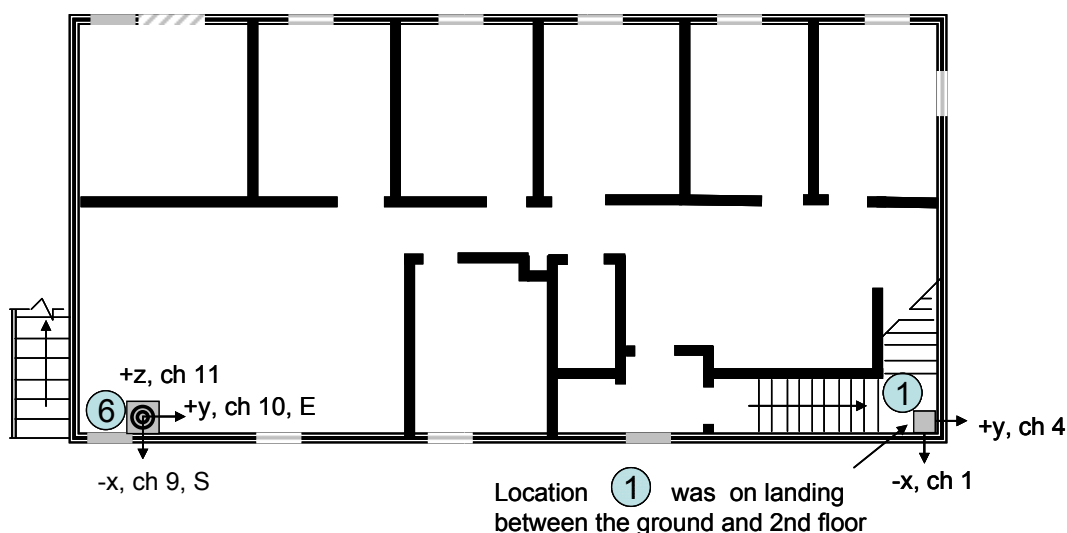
Plan Schematic Showing Numbered Locations and Orientations of Accelerometers for Ground Floor
